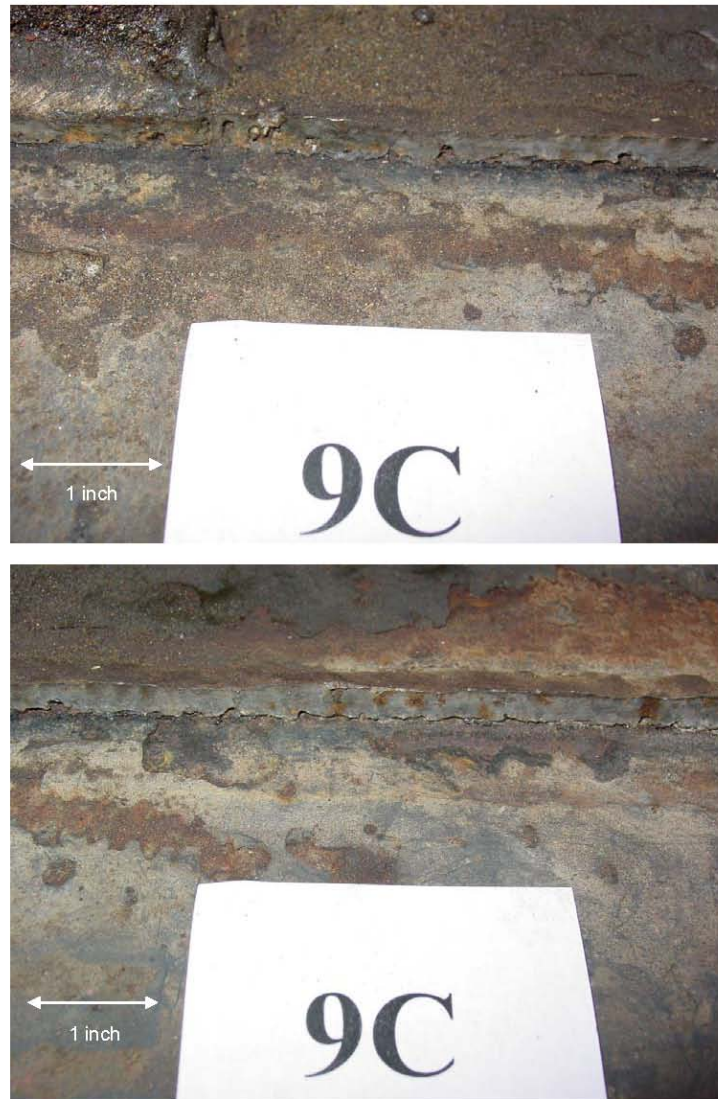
Enlarged Views of Cleaned Weld Fracture on Base Plate 9C Showing Ductile Weld Metal Fracture. Note Weld Root Opening.
